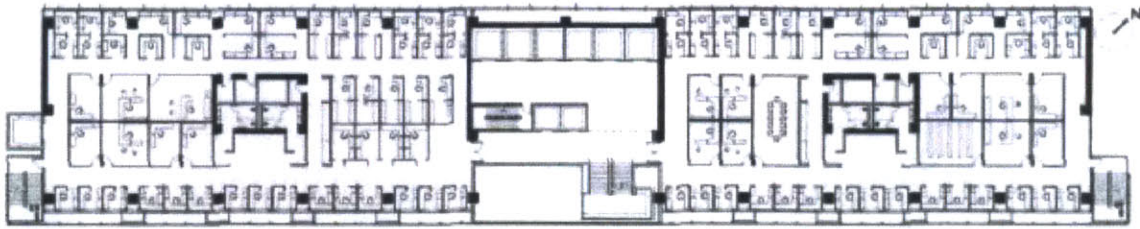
Plan view of San Francisco Federal Building. Source [30]
